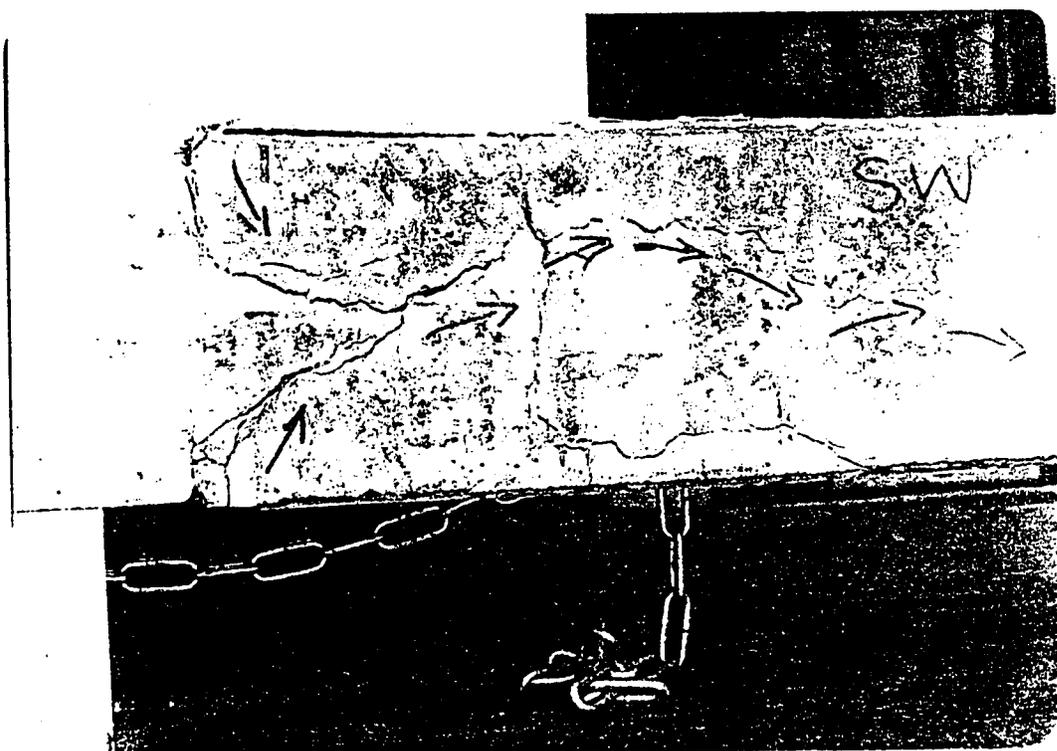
Failure Mode of Beam SW (Formation of Longitudinal Crack at the Beam Soffit Causing Transverse Splitting).
